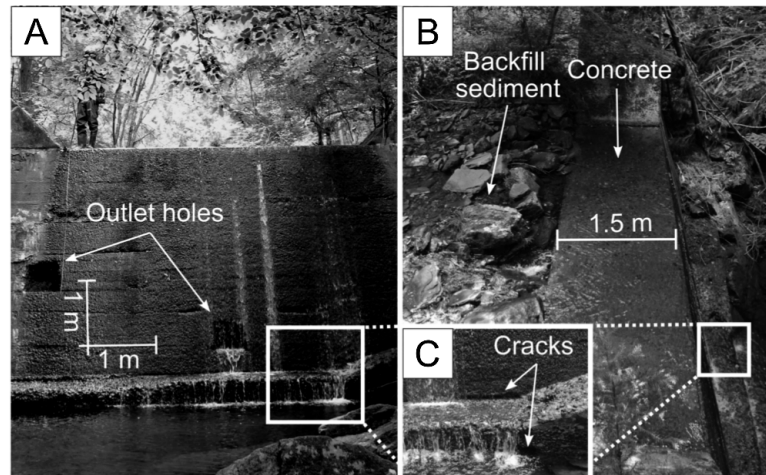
Photos of an impermeable-type concrete check dam in this study area (dam D): (A) front view of the concrete wall; (B) top view of the concrete wall and backfill sediment; and (C) base of the concrete wall with cracks through which infiltrated water drained.
